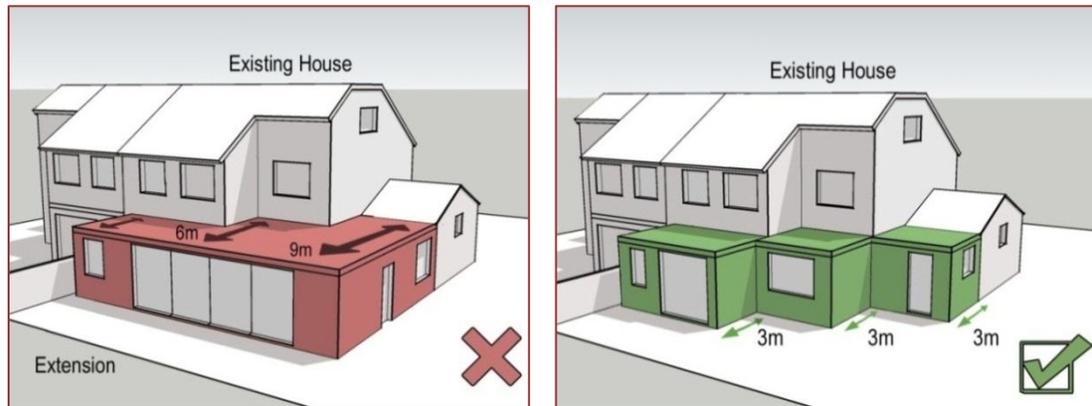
Infill extensions: the stepped appearance of the original house should be maintained, as illustrated by the drawing on the right
